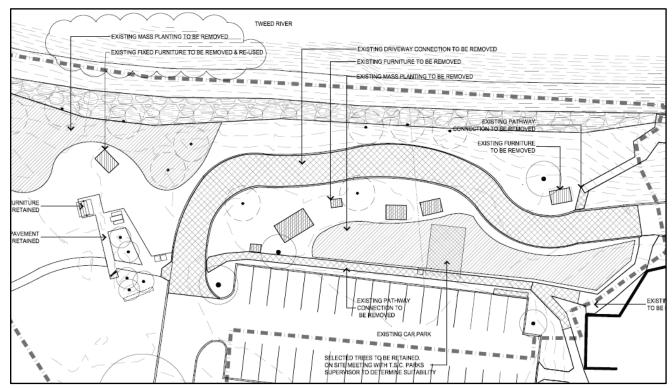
Areas of vegetation and existing roadway to be removed as part of riverbank stabilisation works. The roadway and riverbank vegetation must be removed under both options considered to stabilise the river bank.
